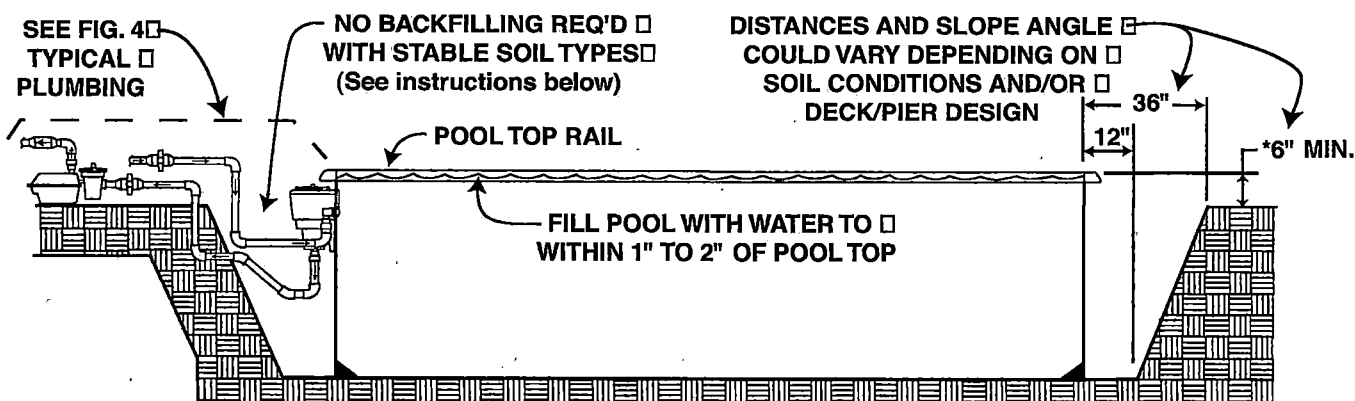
PREPARATION FOR REDWOOD DECK INSTALLATION
